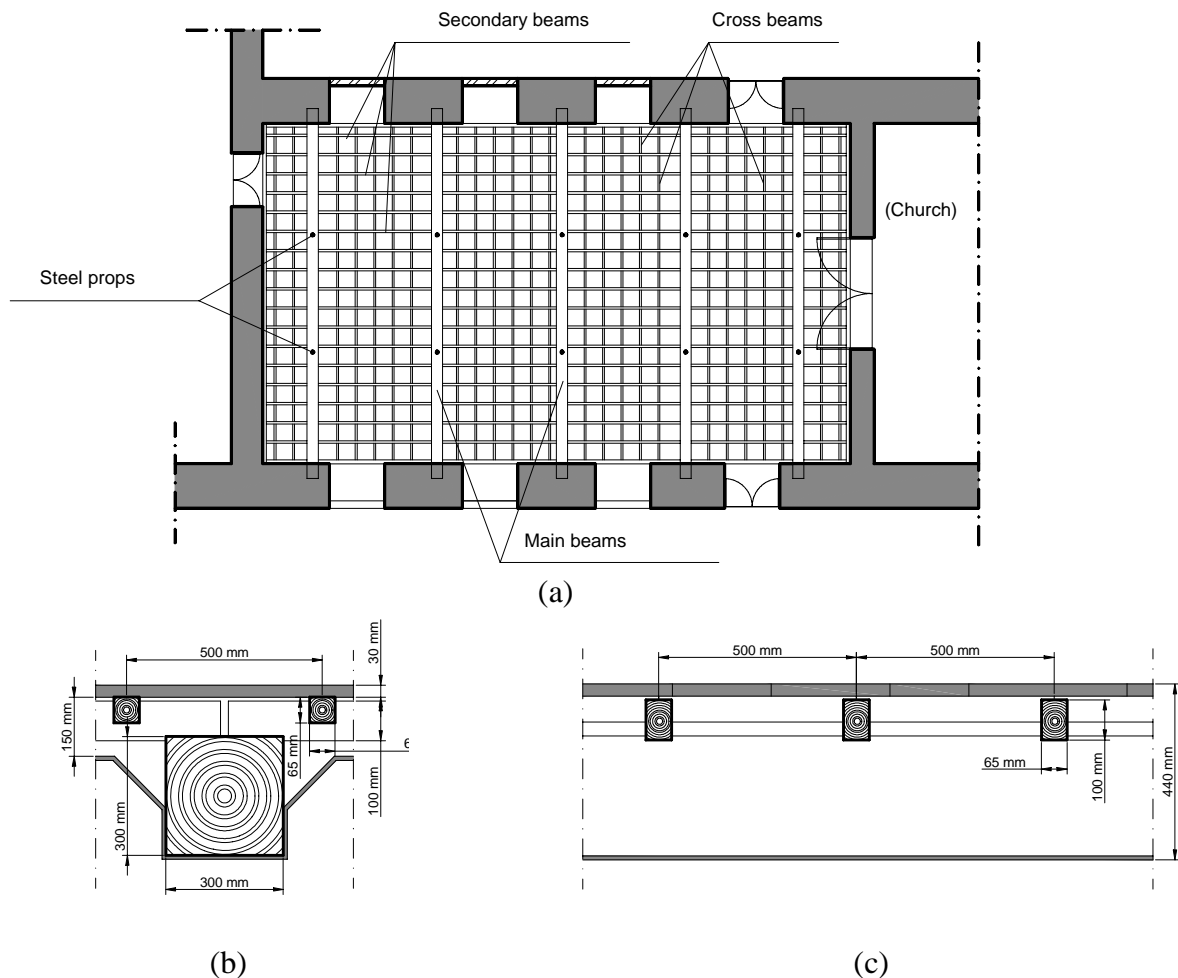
Timber structure: (a) plan; (b) cross-section of the main beams; (c) cross-section of the secondary beams
